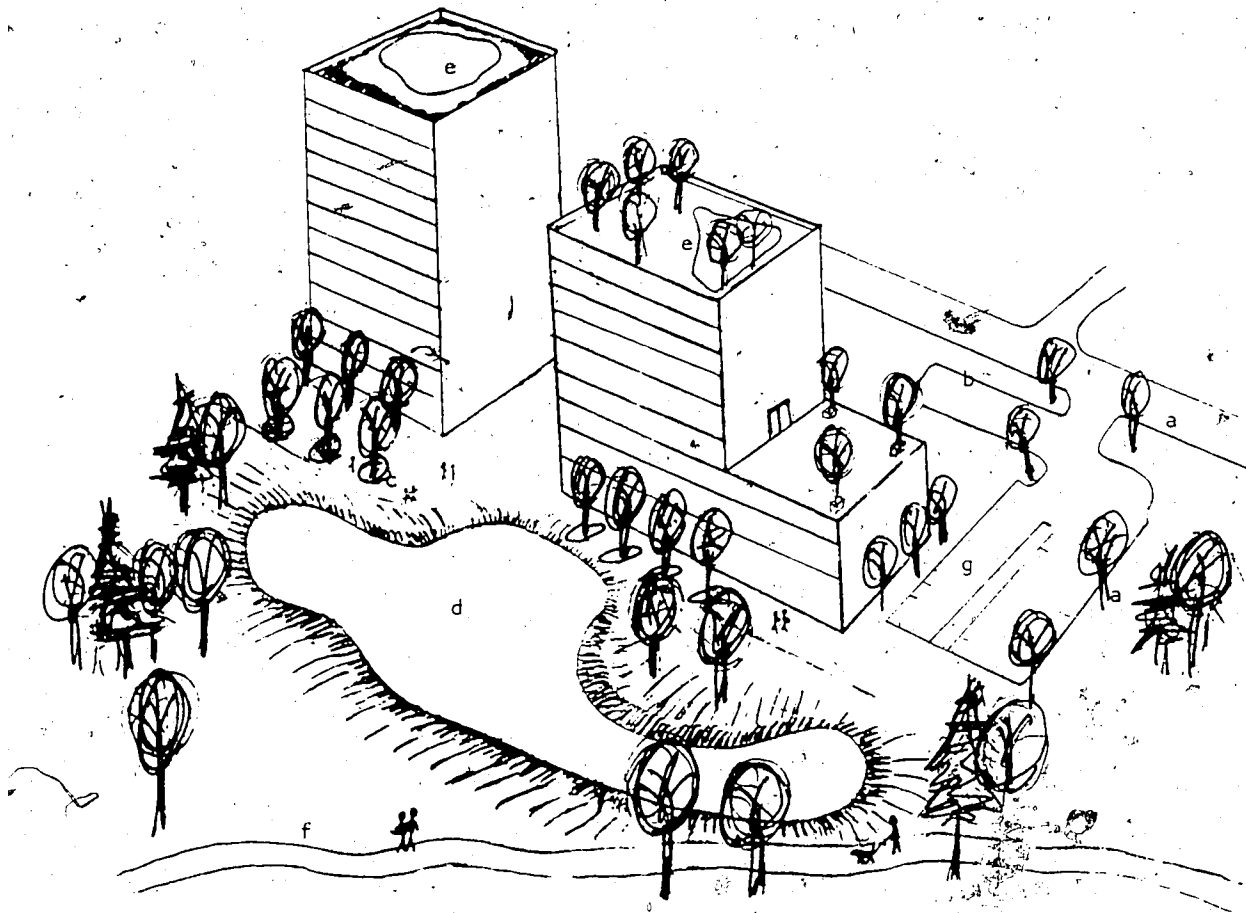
Examples of On-site Alternatives: a) curb cuts, b) grass strips, c) tree saucers, d) stormwater lake, e) rooftop storage, f) grass pavers, g) porous pavement. (Source: author).
